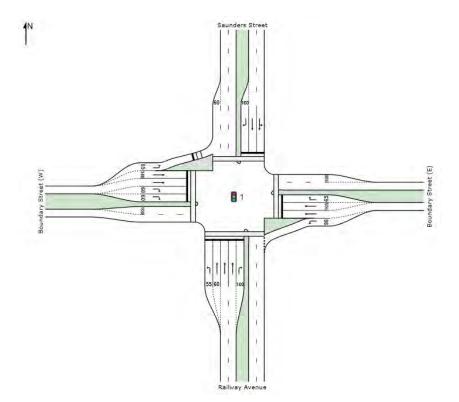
Proposed layout for Railway Avenue, Boundary Street and Saunders Street to improve performance for year 2023 base traffic
